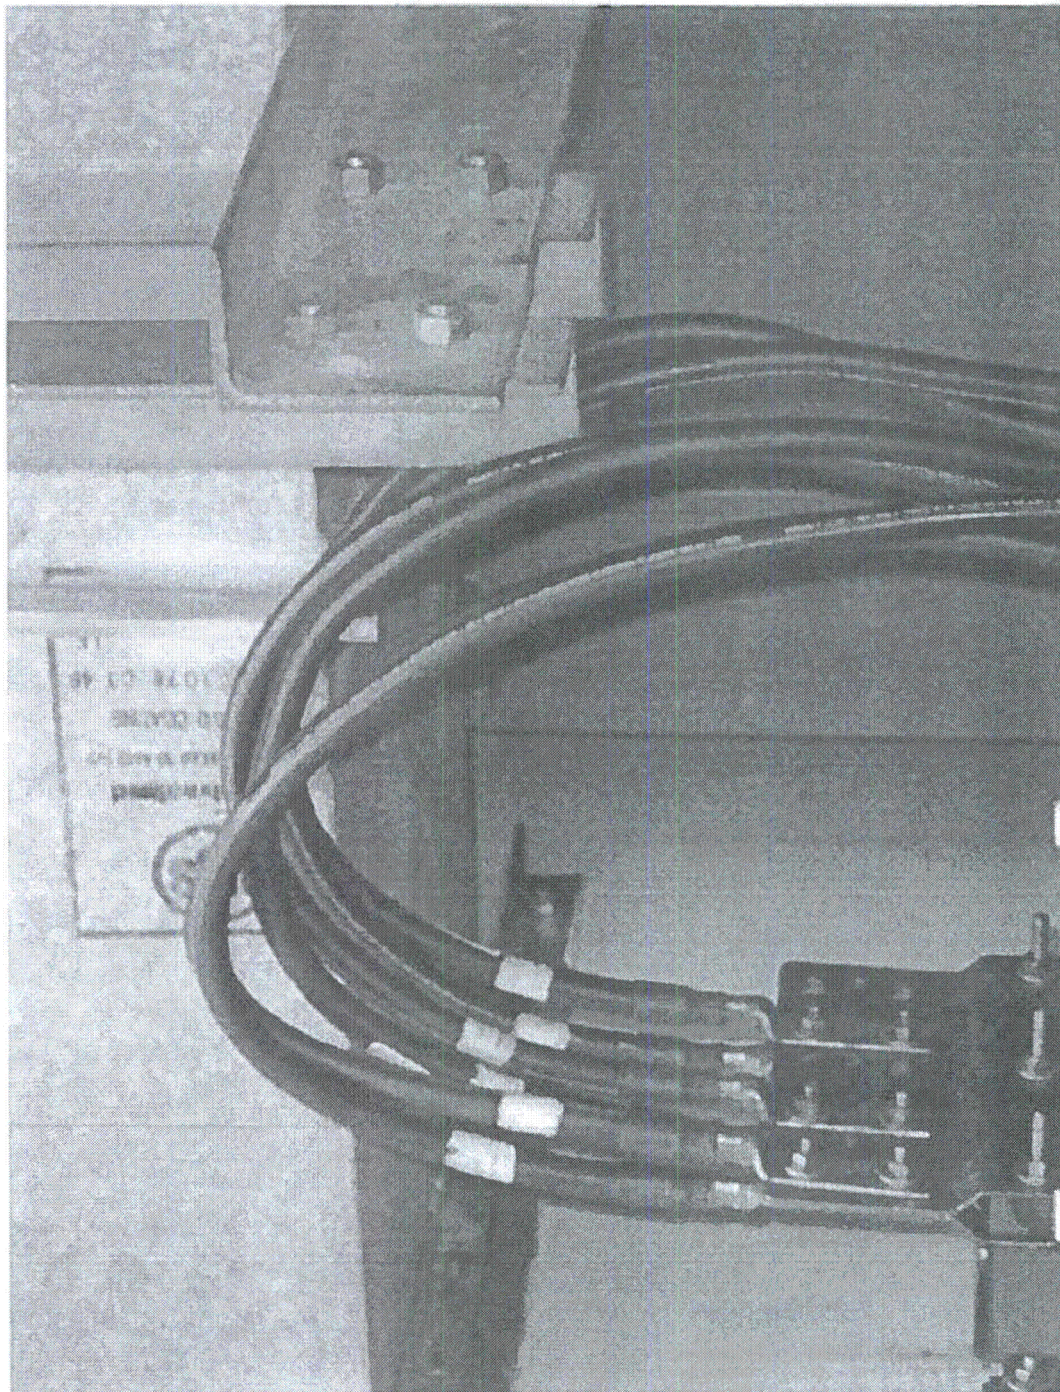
Battery Cable and HVAC Spacing (Unit 2 Control TD-T13)
